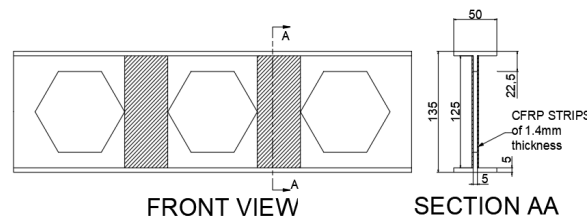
Provision of transverse CFRP Stiffeners to castellated beam
